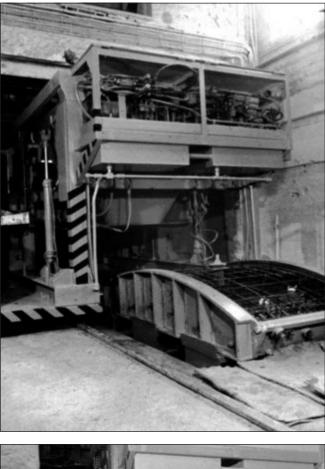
Manufacturing equipment to prefabrication the tunnel lining segment elements
